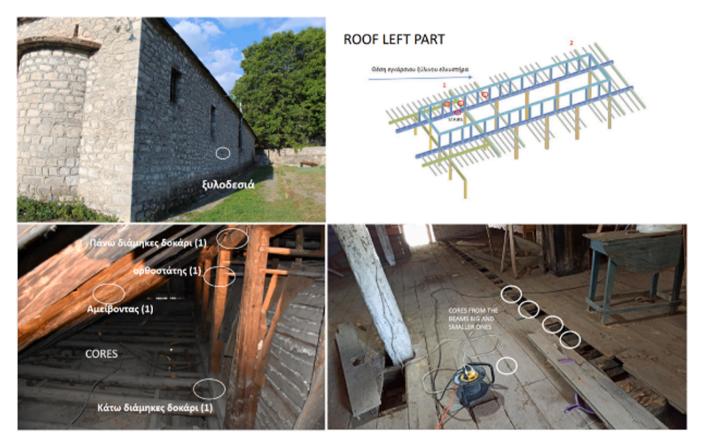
Locations recommended for sampling by the team responsible for the restoration study (including the roof floor and timber reinforcements of the masonry walls).
